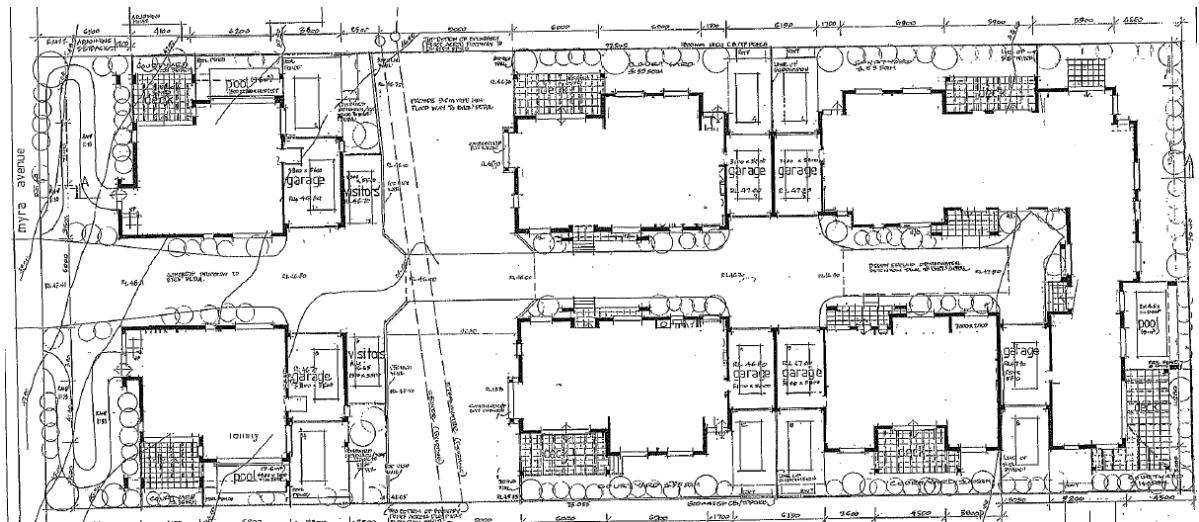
Site plan of seven (7) dwellings proposed under LDA2017/0287
